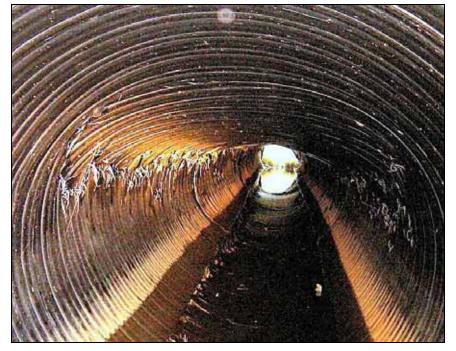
Single wall corrugated HDPE pipe experiencing wall crushing.
